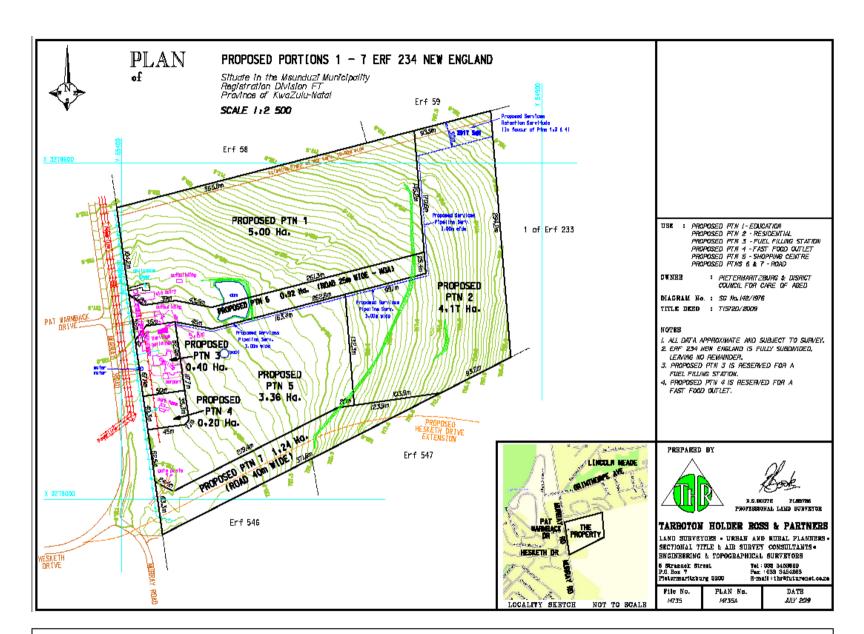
Draft Layout Map showing the property for the proposed mixed-use development, 220 Murray Road, Pietermaritzburg, KwaZulu-Natal (Source: Google Earth).
